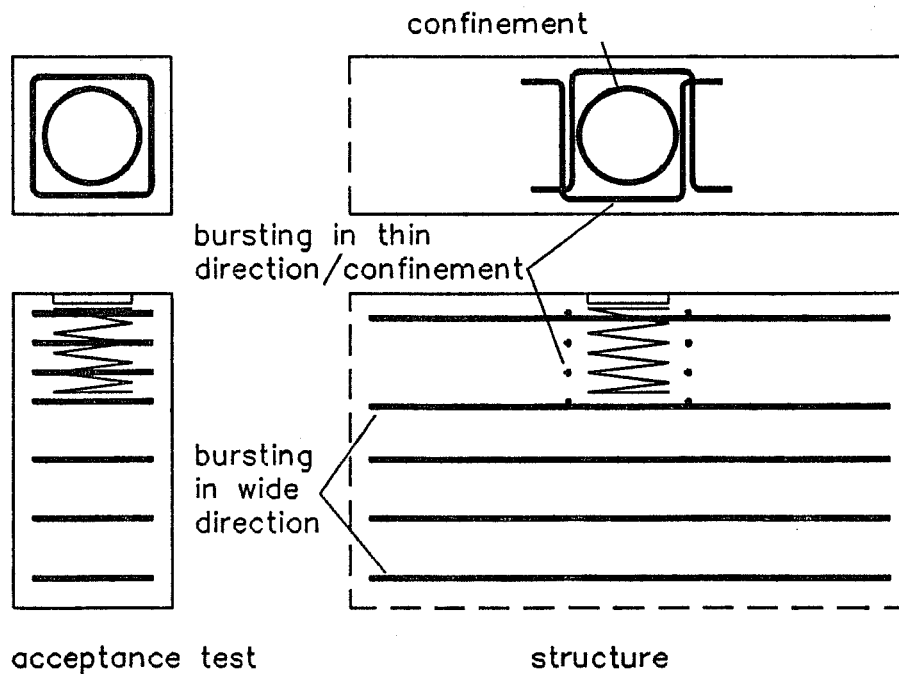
Local Zone Details in Acceptance Test and in Actual Structure
